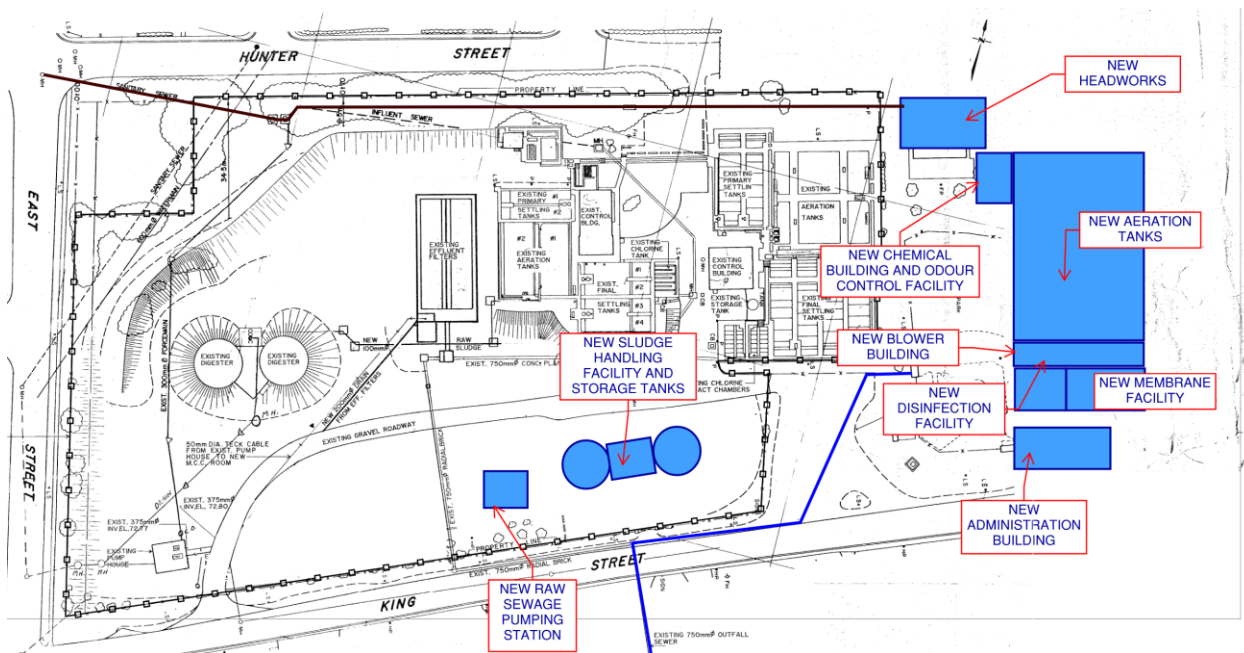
Design Concept 2 - Conceptual Site Layout of the MBR Process
